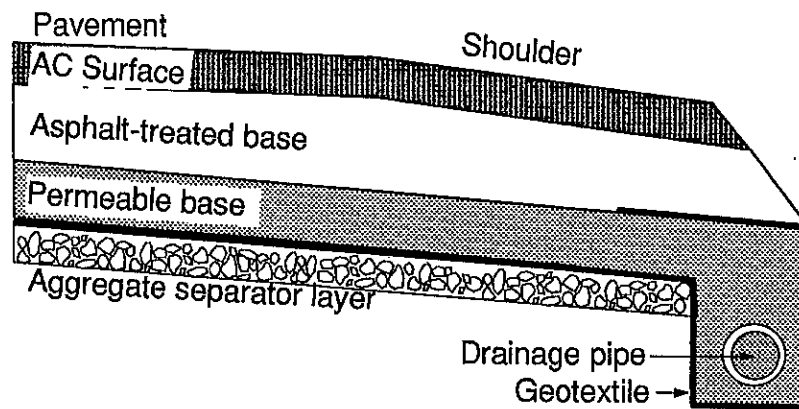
Recommended cross section of full subdrainage system for flexible pavement.
